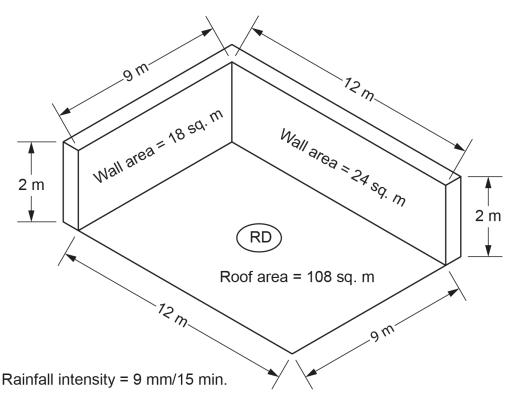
Flat roof with two vertical adjoining walls. (Skilled Trades BC, 2021) Used with permission.
